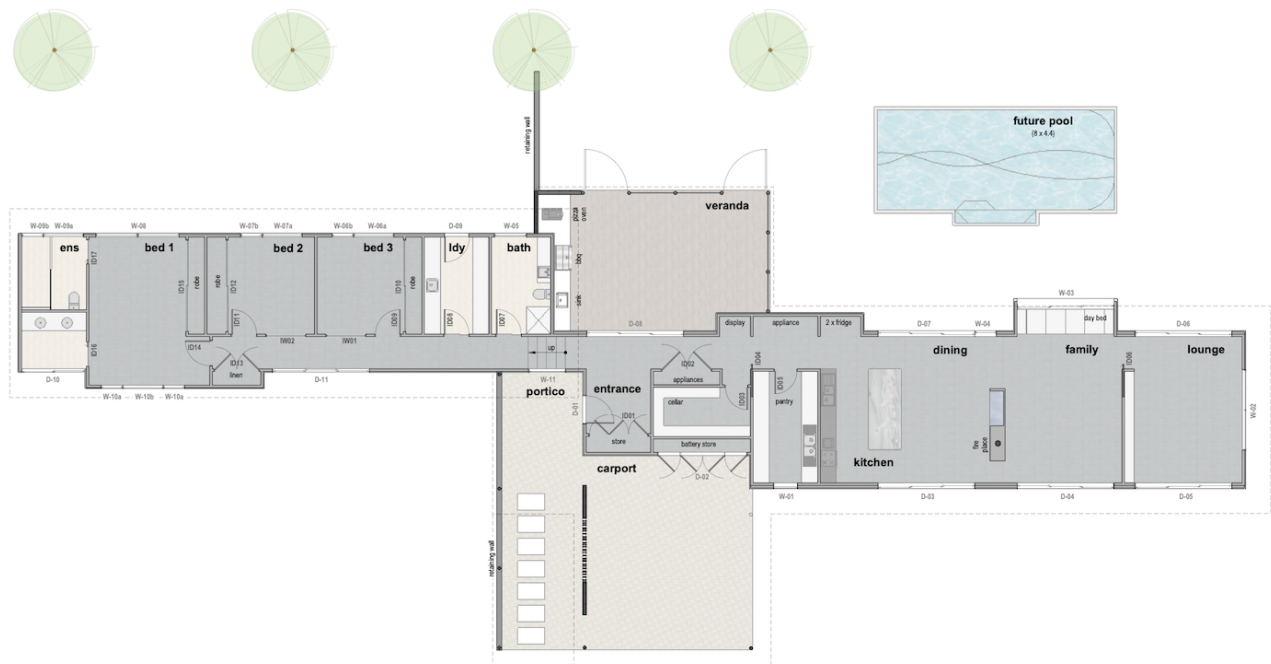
Source: Gavin Dale Design. Proposed Residence Floor Plan - September 2023.
